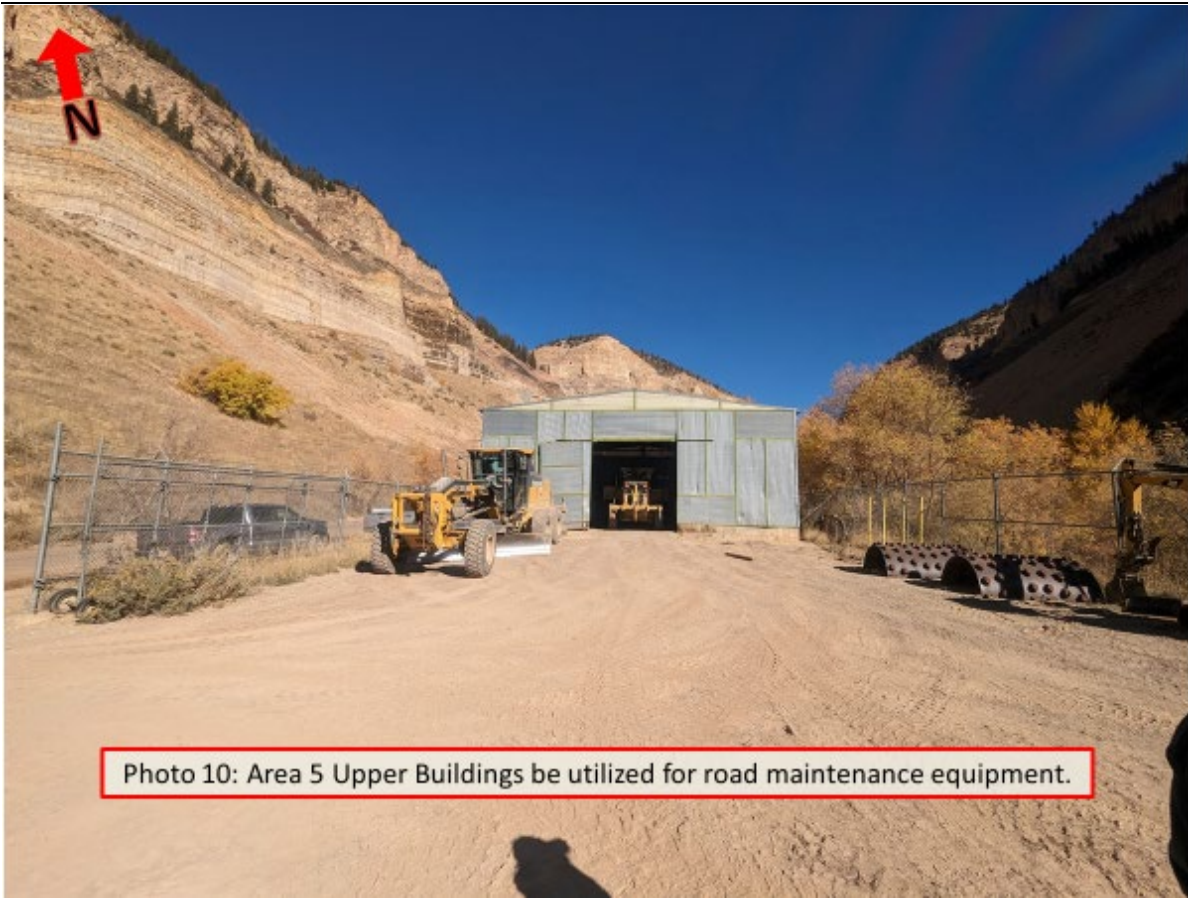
Area 5 Upper Buildings be utilized for road maintenance equipment.
